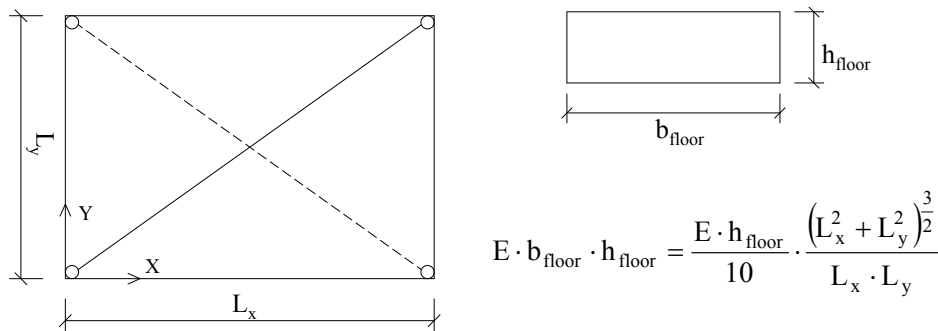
Diagonal elastic trusses for modeling floor slabs
